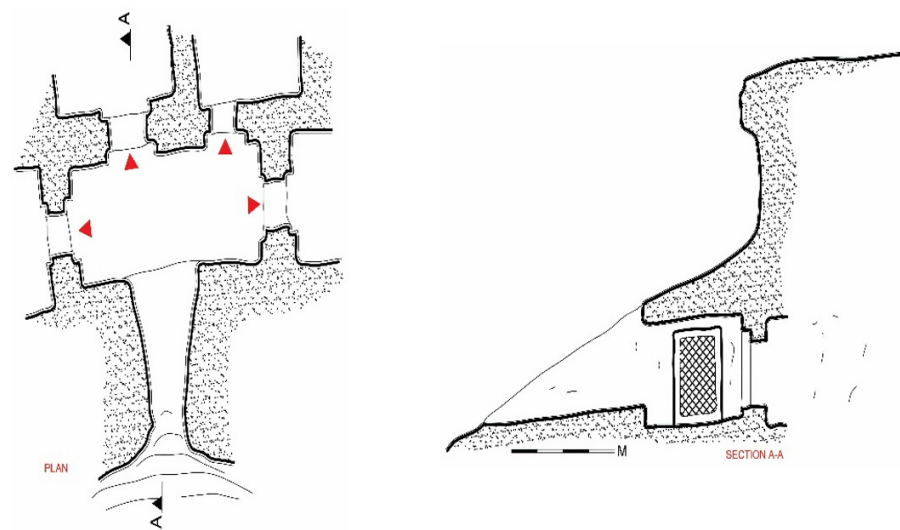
The first stage of excavation (excavation of entrance trench, i.e., Kicheh) in cross-section and plan view.
